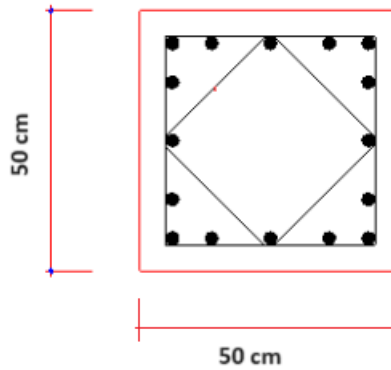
Determined reinforcement layout in a 50cmx50cm column
